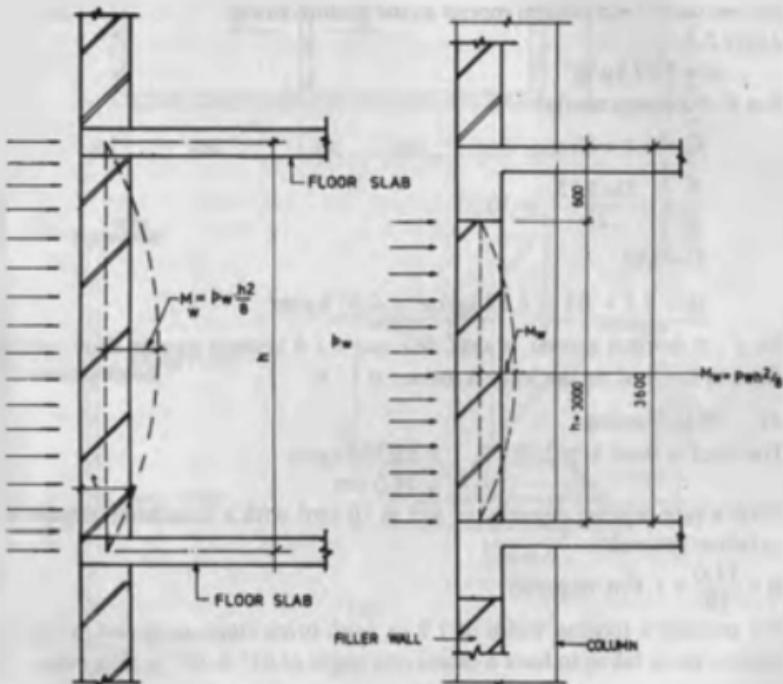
Wind force on an external brick wall. Fig. 5.3. Wind pressure on filler brick walls.
